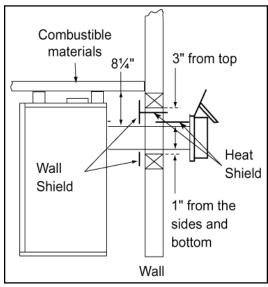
Venting Clearances to Combustible Materials (Rear Vent)
